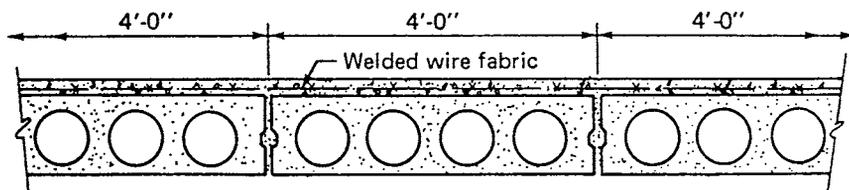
Precast-concrete plank floor with concrete topping.
